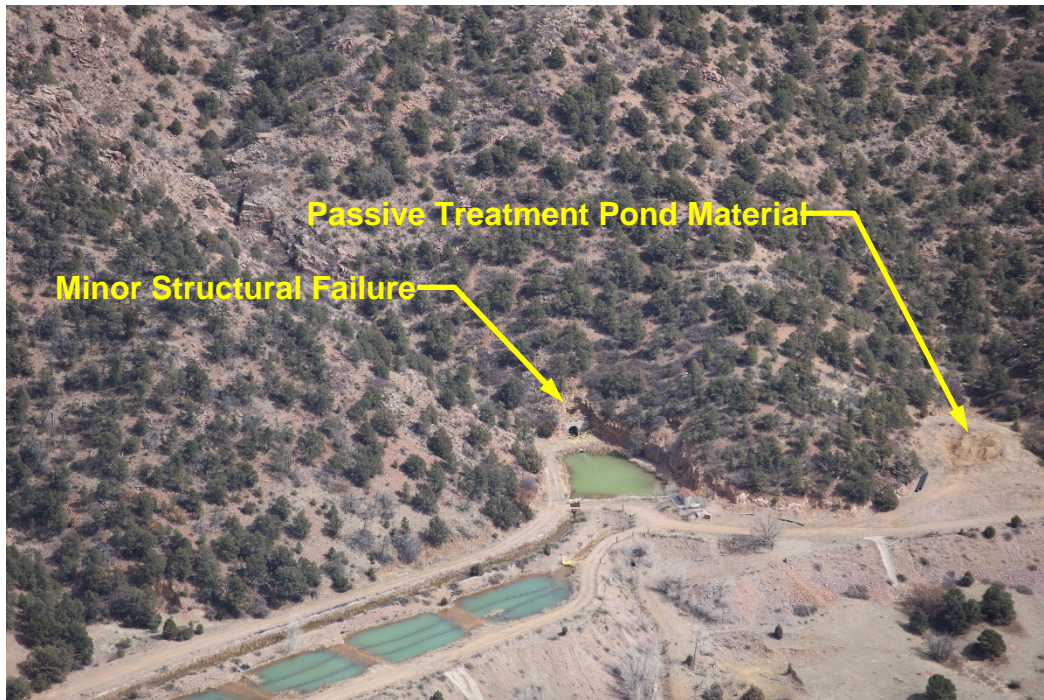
Carlton Tunnel outlet and Disturbed area to the south (looking east).
